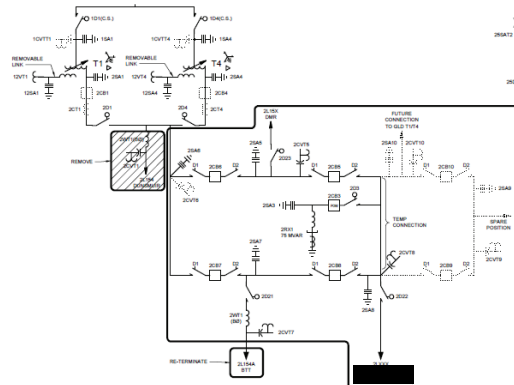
Stations Planning One-Line Sketch for the GLD Substation.
